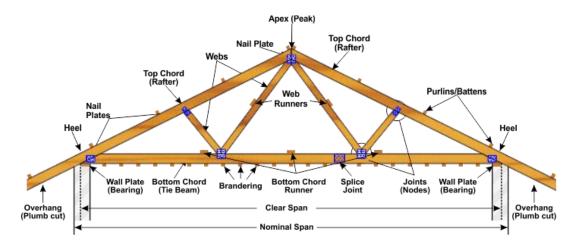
Typical truss showing structural elements as they will feature in the sheep shearing shed design. Please note that the brandering will only be required for the office/store room.
